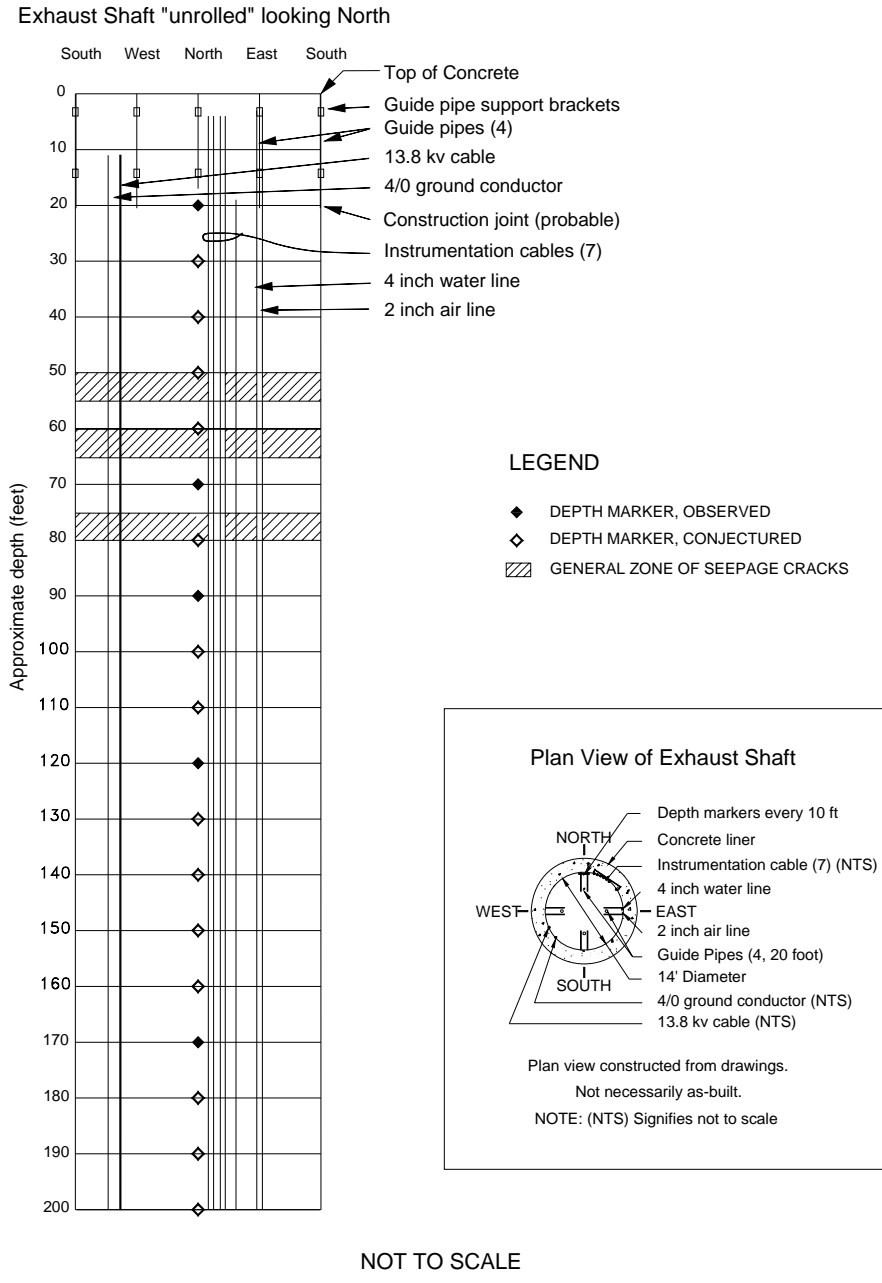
Diagram of Exhaust Shaft Fixtures and Seepage Zones (Upper 200 ft)
